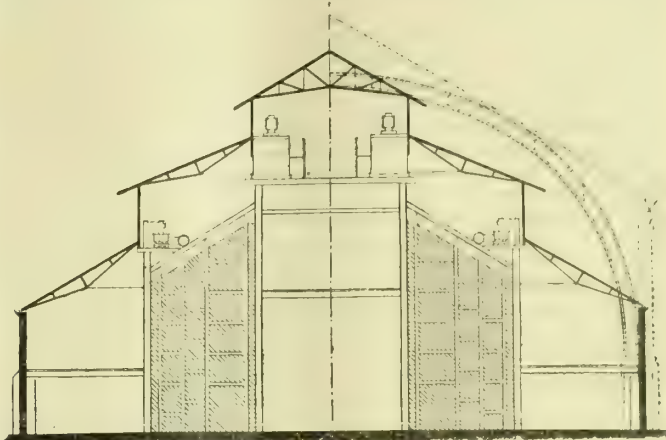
PROPOSED CONSTRUCTION OF ROOFS SUPPORTED UPON STRUCTURAL IRONWORK FOR INCLINED RETORT BENCH.
